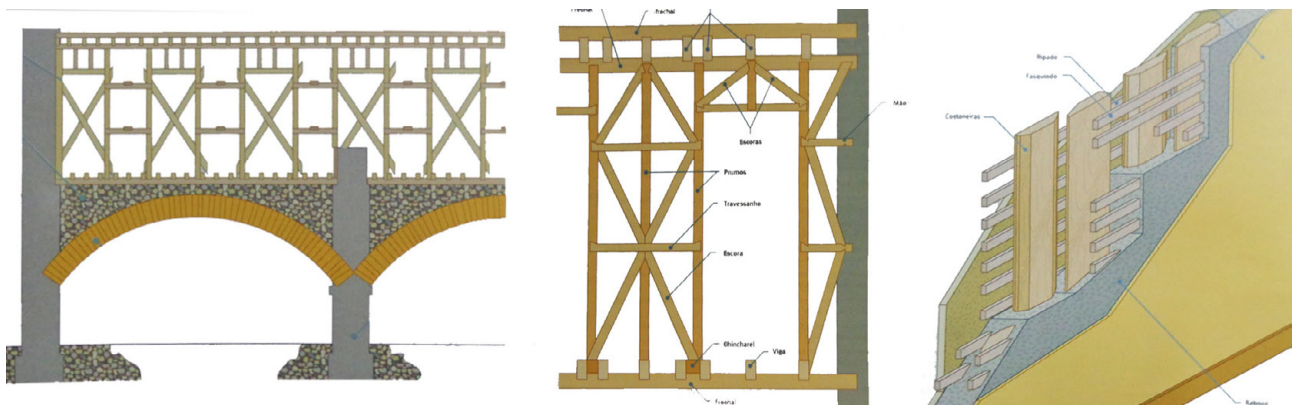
In Appleton J. Reabilitação de Edifícios a) Foundation Structure and Frontal Structure. b) "Frontal" Composition. c) Layers of a "Frontal Wall"
